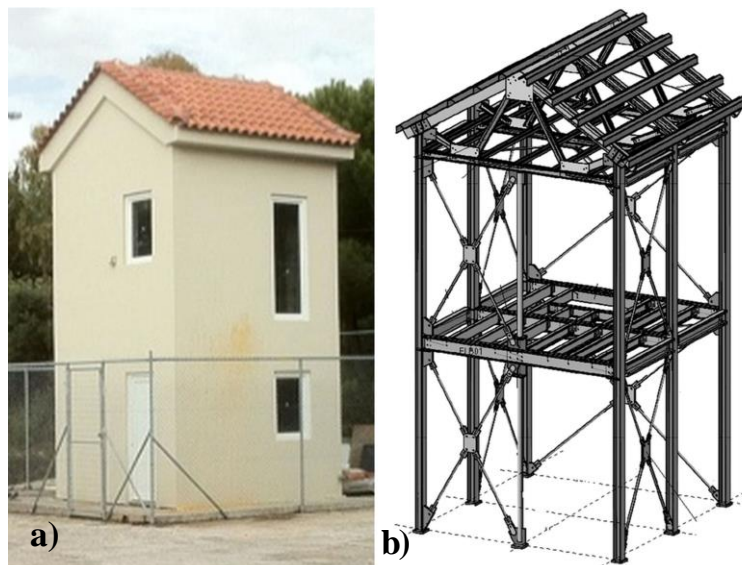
The NTUA mock-up building: a) southwest view and b) its steel load bearing frame.
